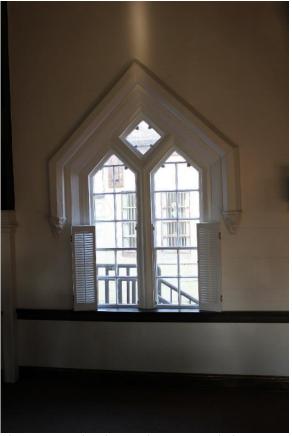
, Historic Courthouse, Second Floor, Room 212, view of a typical window.
